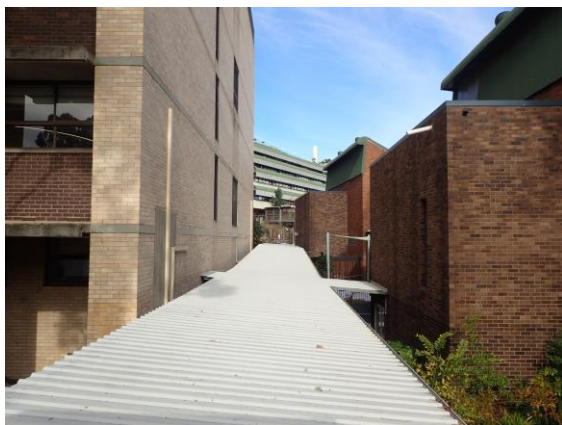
View from the bridge of the roof of the covered walkway between buildings A and B (right side of image) and H (left side of image).
